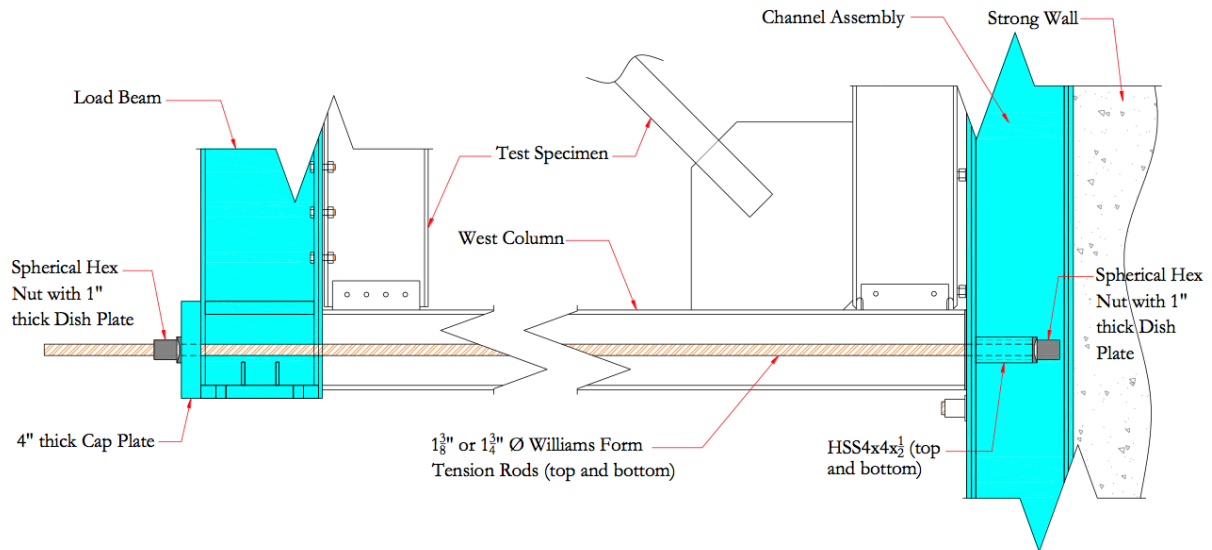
Gravity Load System Layout in the West Column [Powell, 2010]
